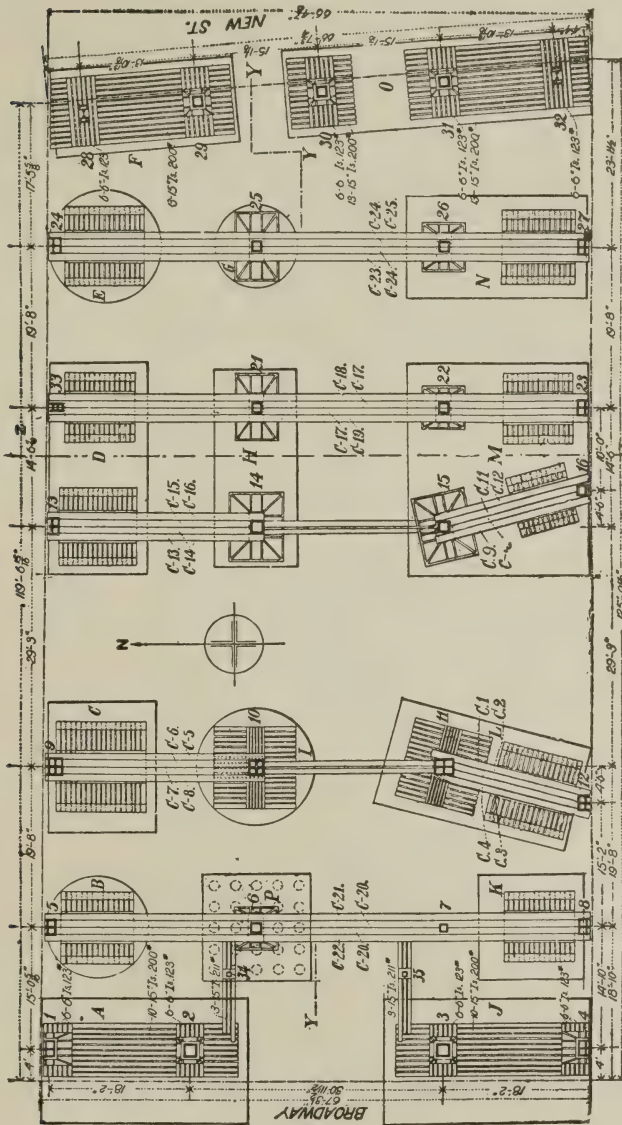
The Manhattan Life Insurance Building, New York City.—Plan of Piers.
